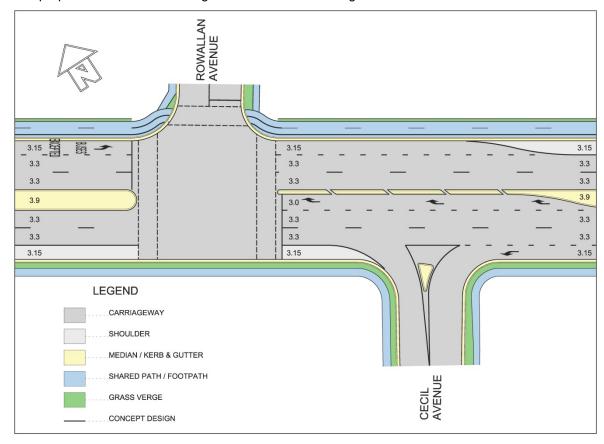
Rowallan Avenue and Cecil Avenue intersections
